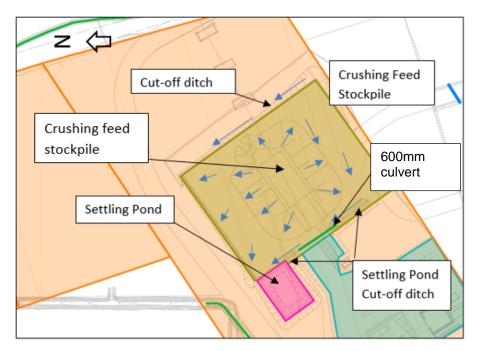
Crushing Feed Stockpile Pad Drainage Plan
